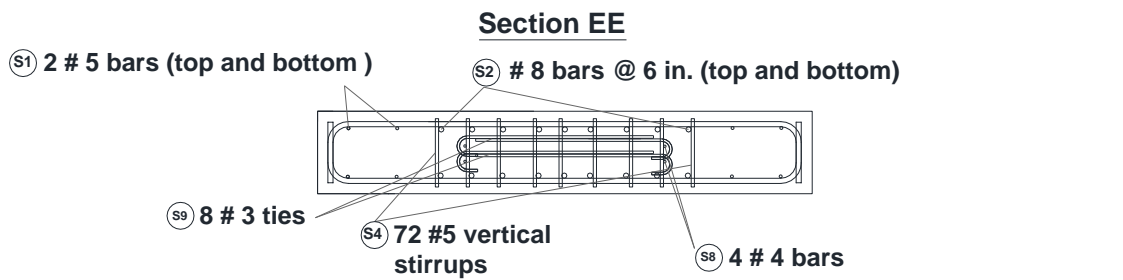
Elevation view of slab reinforcement at Section EE for Specimen #2
